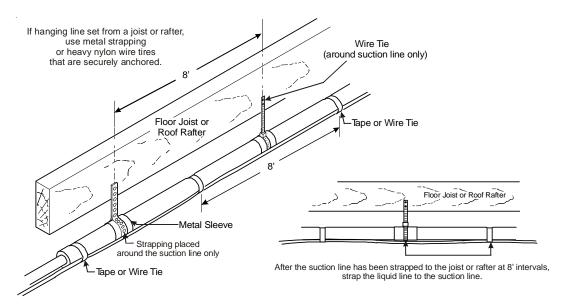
Installation of Refrigerant Piping (Horizontal)
